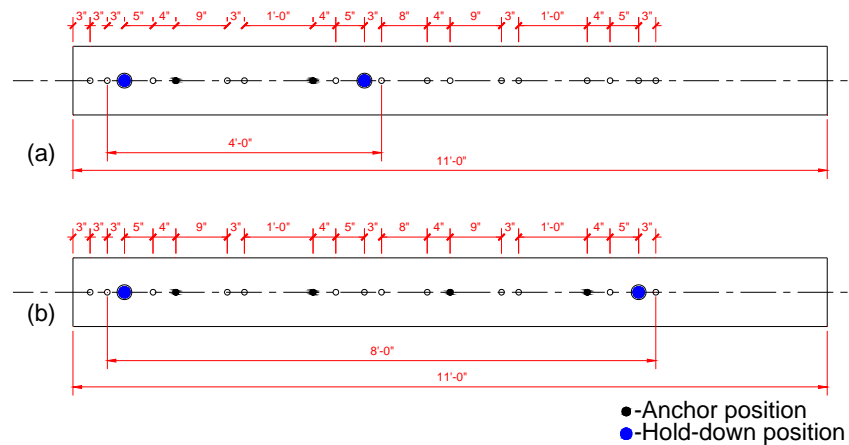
Anchor placement along test frame base (top view) for (a) 4 ft wide walls and (b) 8 ft wide walls.
